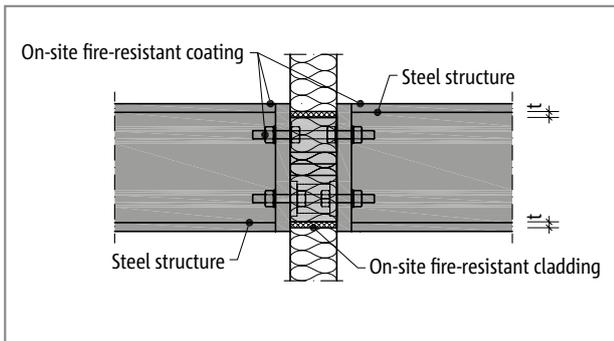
Fire protection Schöck Isokorb® T type S: On-site fire protection cladding T type S, fire protection coated steel structure; section
